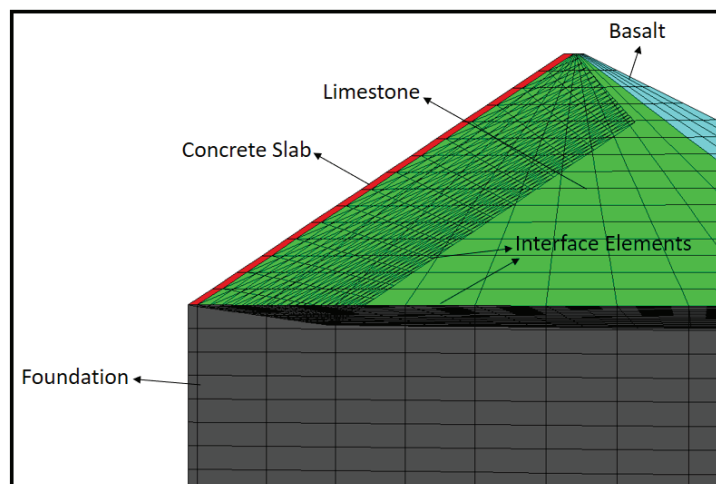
Interface conditions between dam body, foundation and concrete slab of the Ilisu dam.
